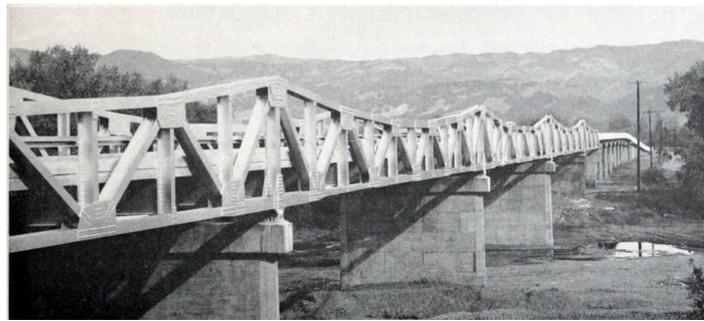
Circa 1949 Bridge looking upstream at the downstream face of the Alexander Valley Road bridge
